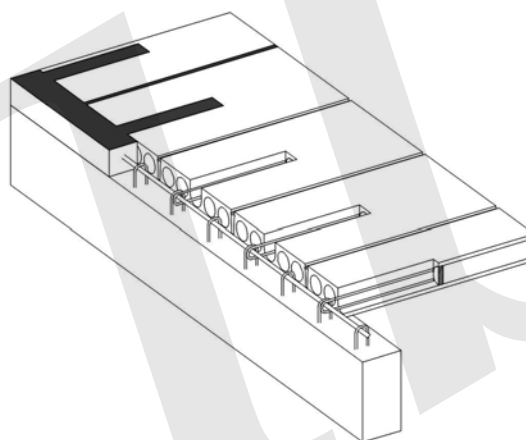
Example of “ring beam” around untopped hollowcore slabs with tie reinforcement in edge insitu concrete strips.
